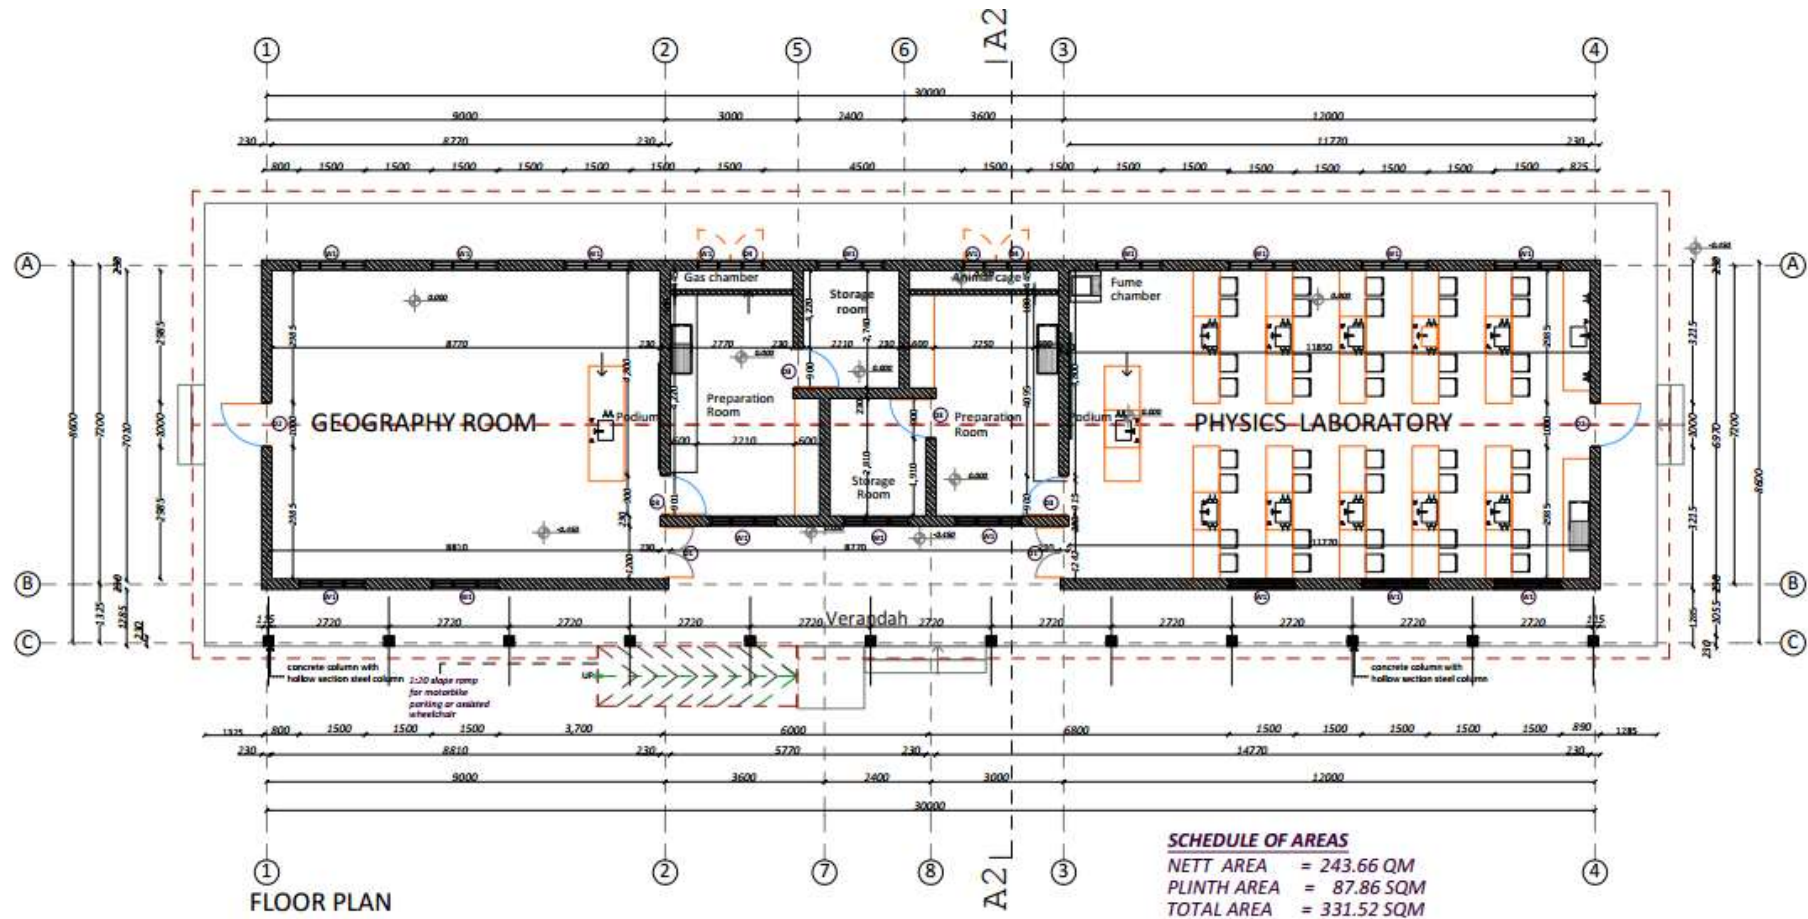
Proposed layout of the Laboratory room to be constructed
